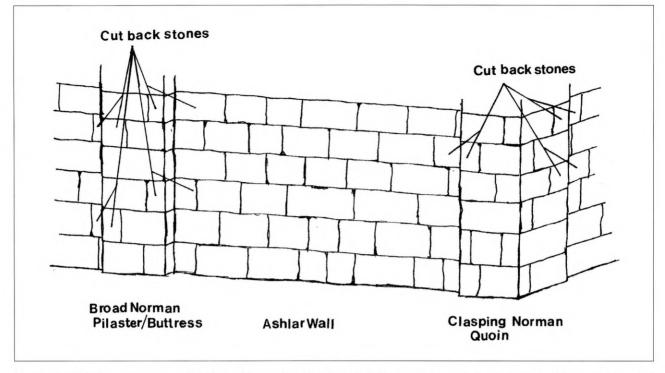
A typical post-Conquest, bonded ashlar wall with a broad shallow pilaster and clasping quoin. Where they overlap the proud faces, stones will have been, of necessity, cut back. The vast majority of the stones in the wall and the structures will have been placed with their bedding orientation horizontal
